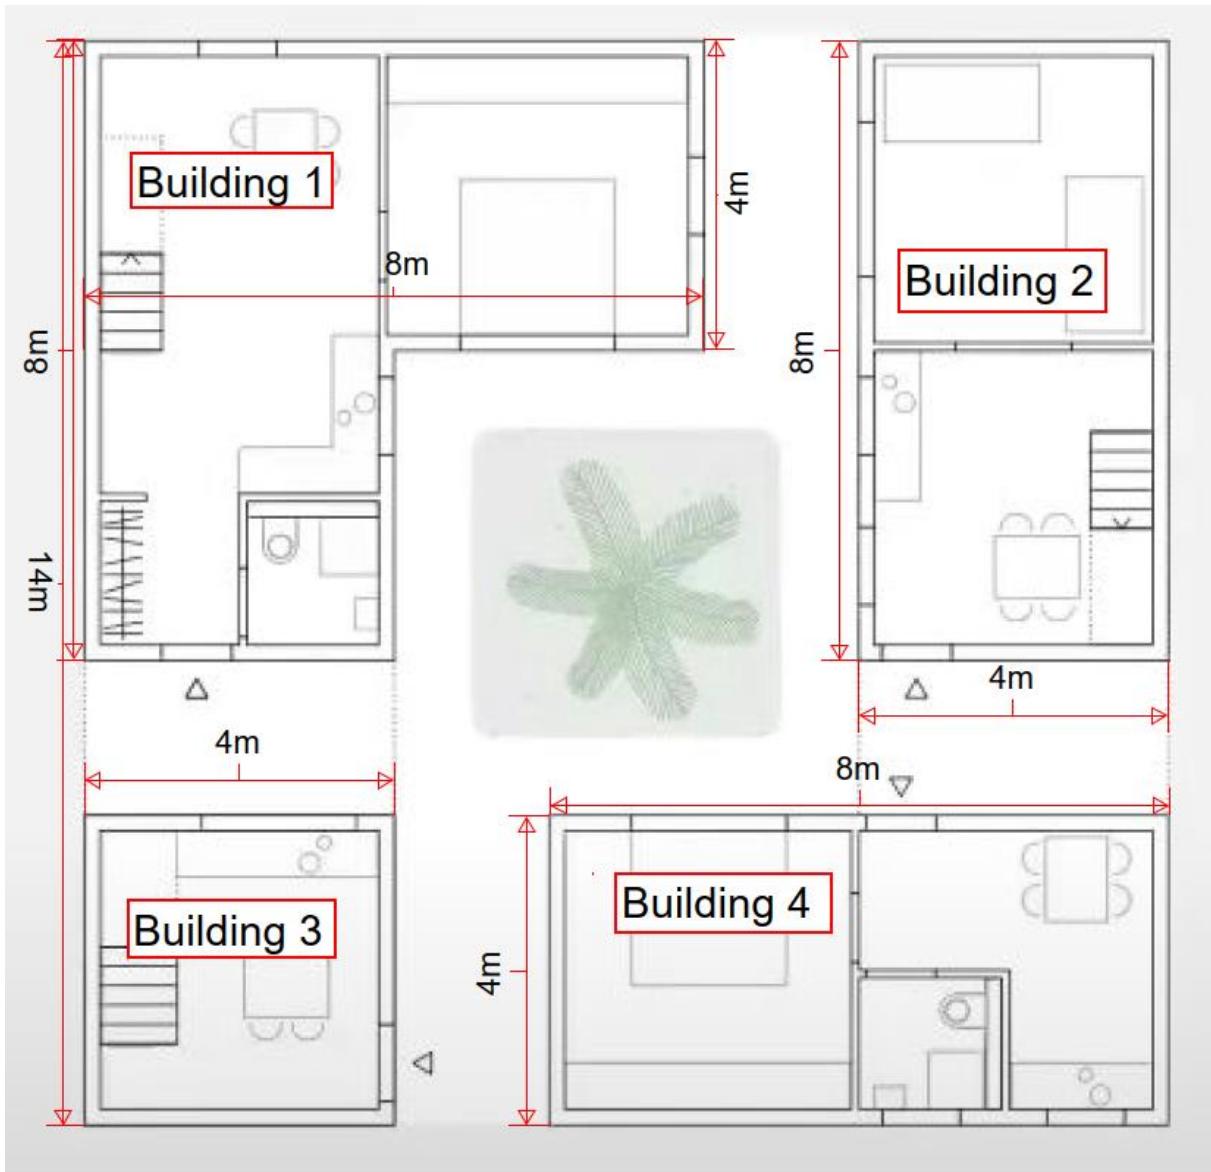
Dimensioned floor plan of the design ¹⁰¹
